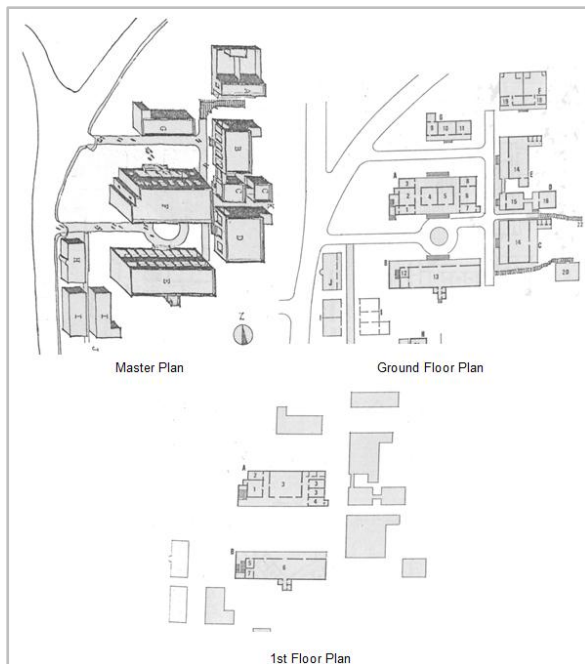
All Floor Plans of Hospital 'A' (Hussain, 1988)
